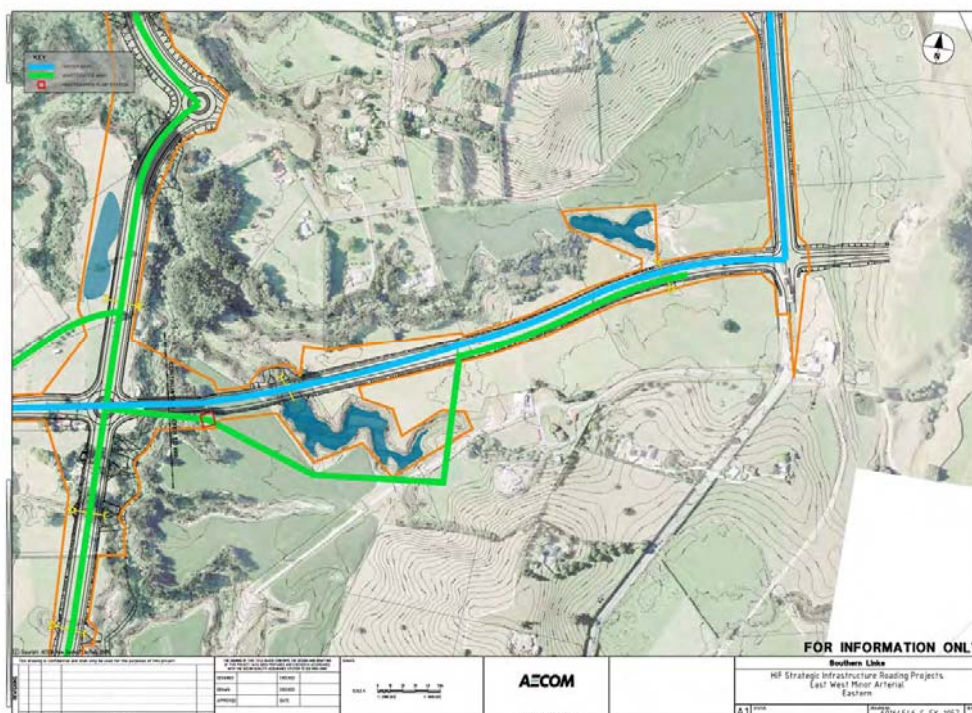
East-West arterial and eastern section from North-South arterial to Peacocke Road
